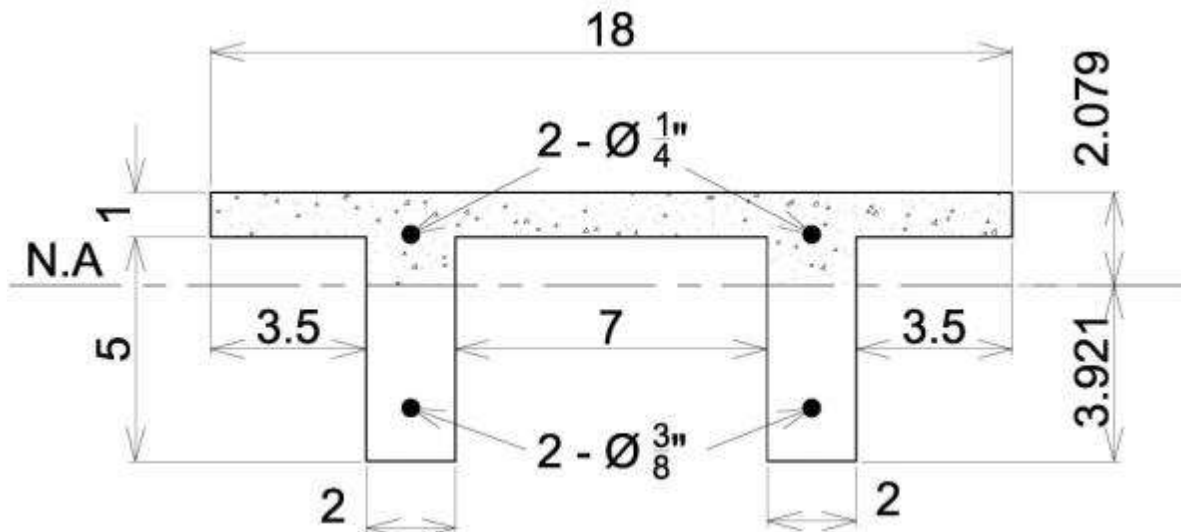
Cross-section of profiled concrete panel (Dimensions are in inches)
